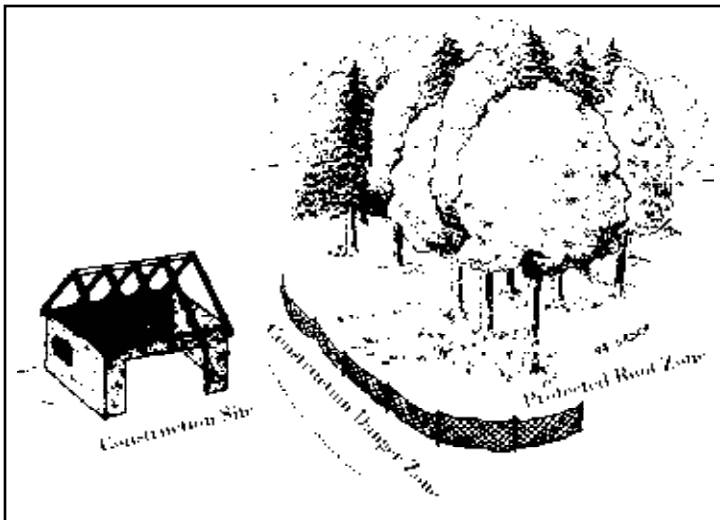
Determining the construction danger zone between the protective fence and the building site assists with final site and building design and selection of equipment to be used. Note that the tree protective fence is placed in front to prevent access and disturbance to the protected root zone.
